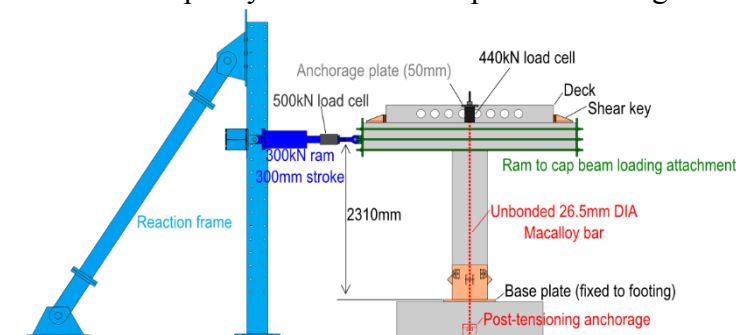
Experimental test set up showing that the bridge was loaded by a single ram at the cap beam level
